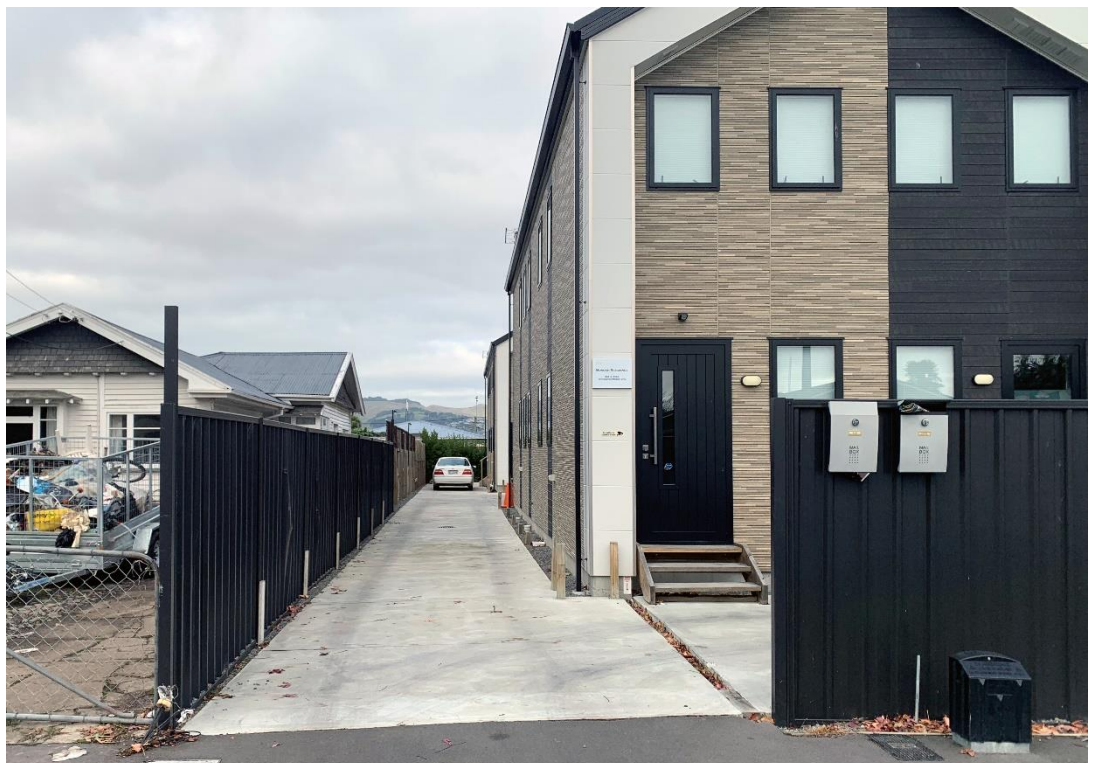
338 Worcester Street (Chch), 3m formed accessway with no planting.
